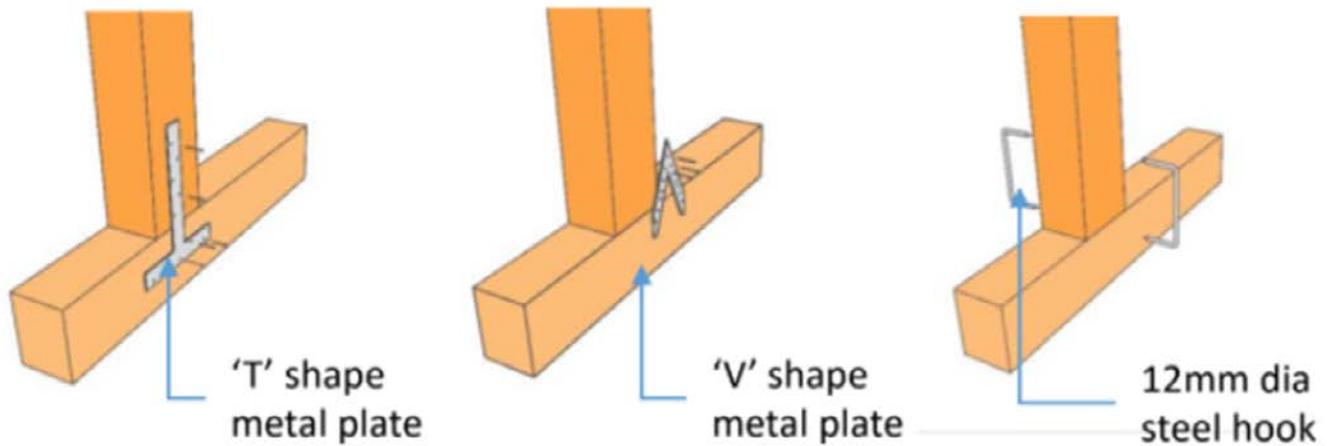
Detail at B: Horizontal and vertical connections at intermediate locations
